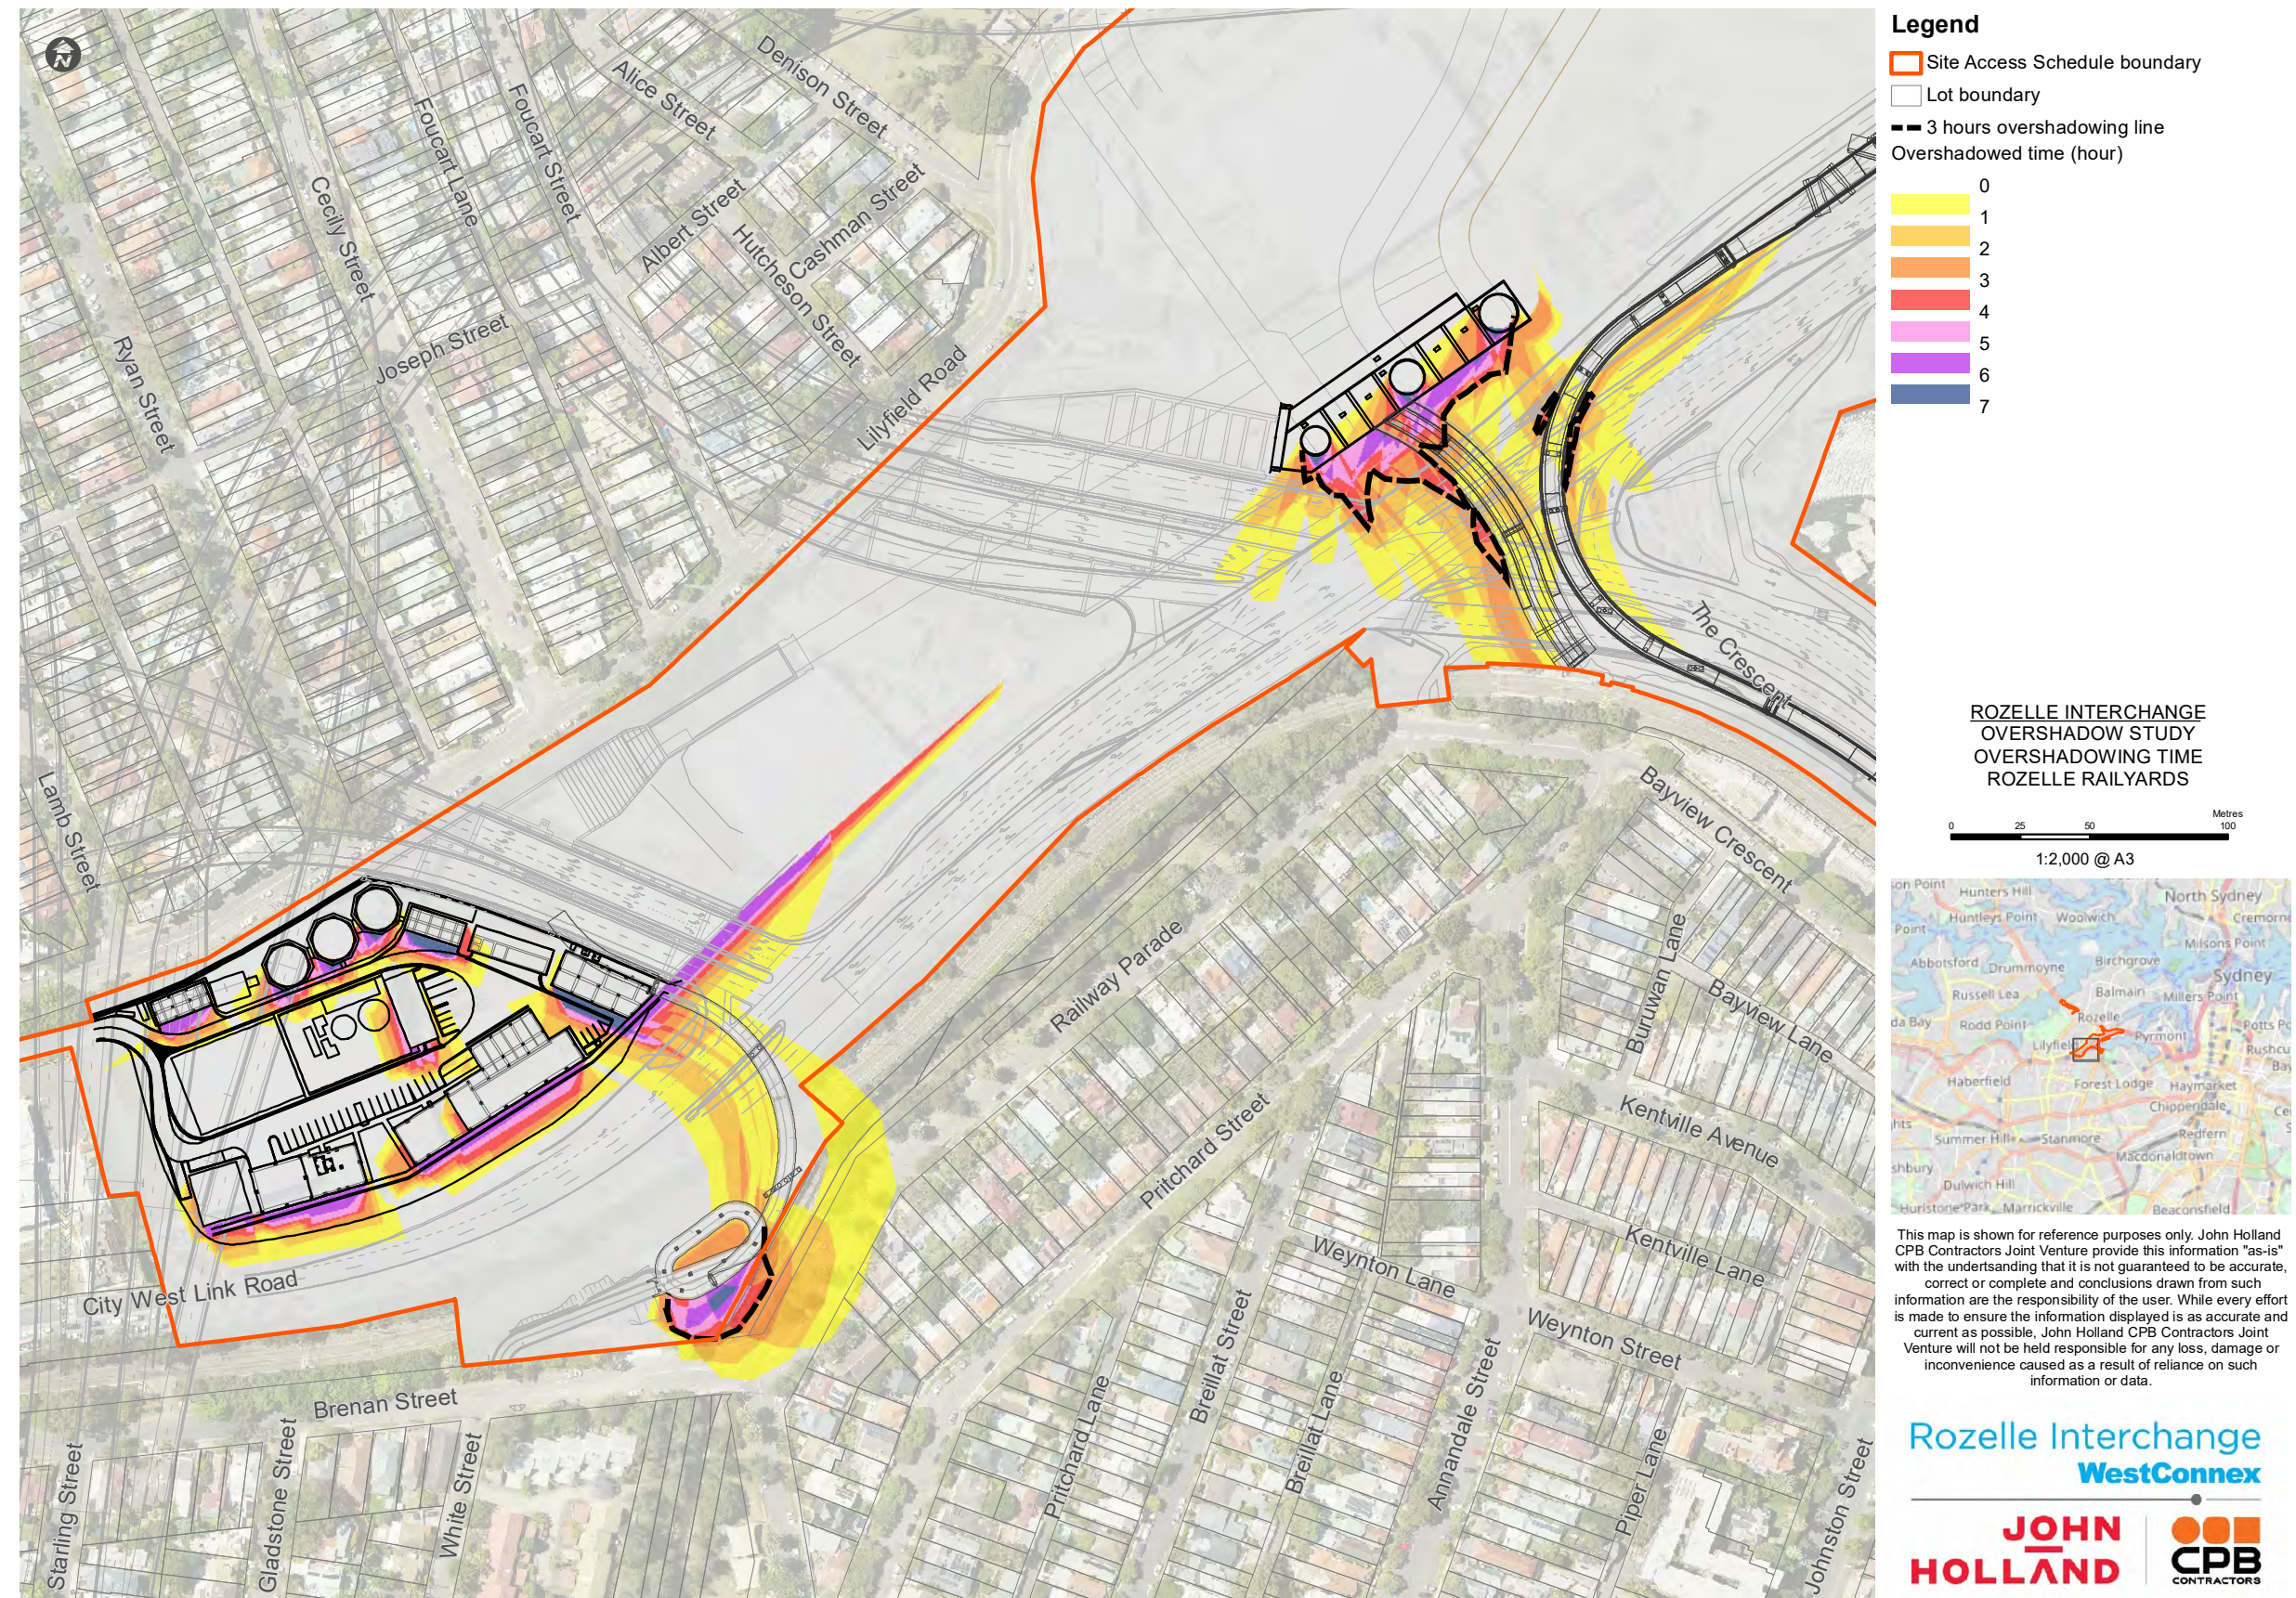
Overshadowing Impacts Green Link Bridge, MOC 2, Rozelle Railyard Ventilation Outlets, Whites Creek Bridge
